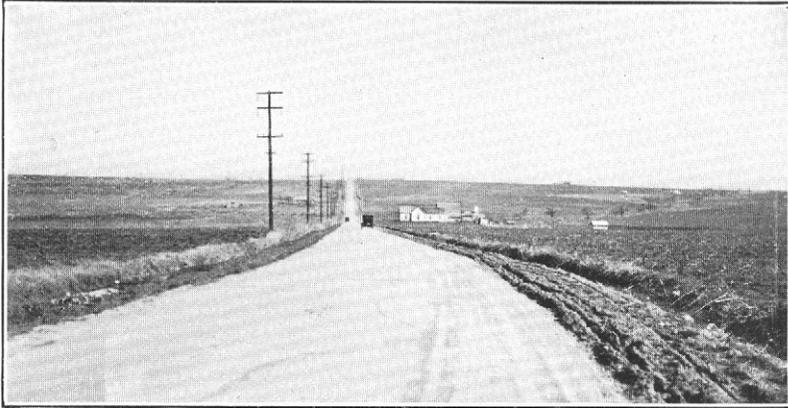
CONCRETE ROAD CROSSING ROCKWALL COUNTY
